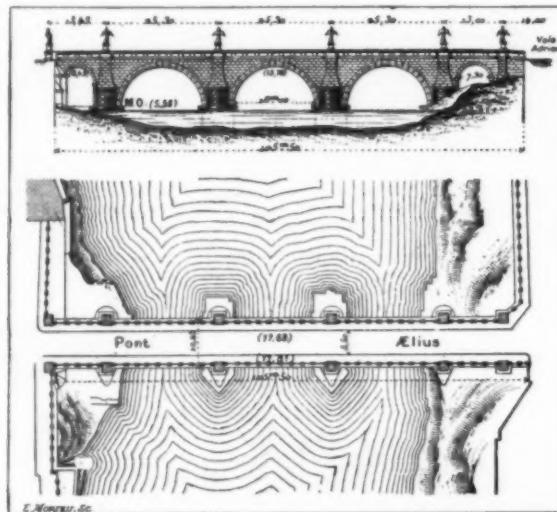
ELEVATION AND PLAN OF THE AELIUS BRIDGE.
